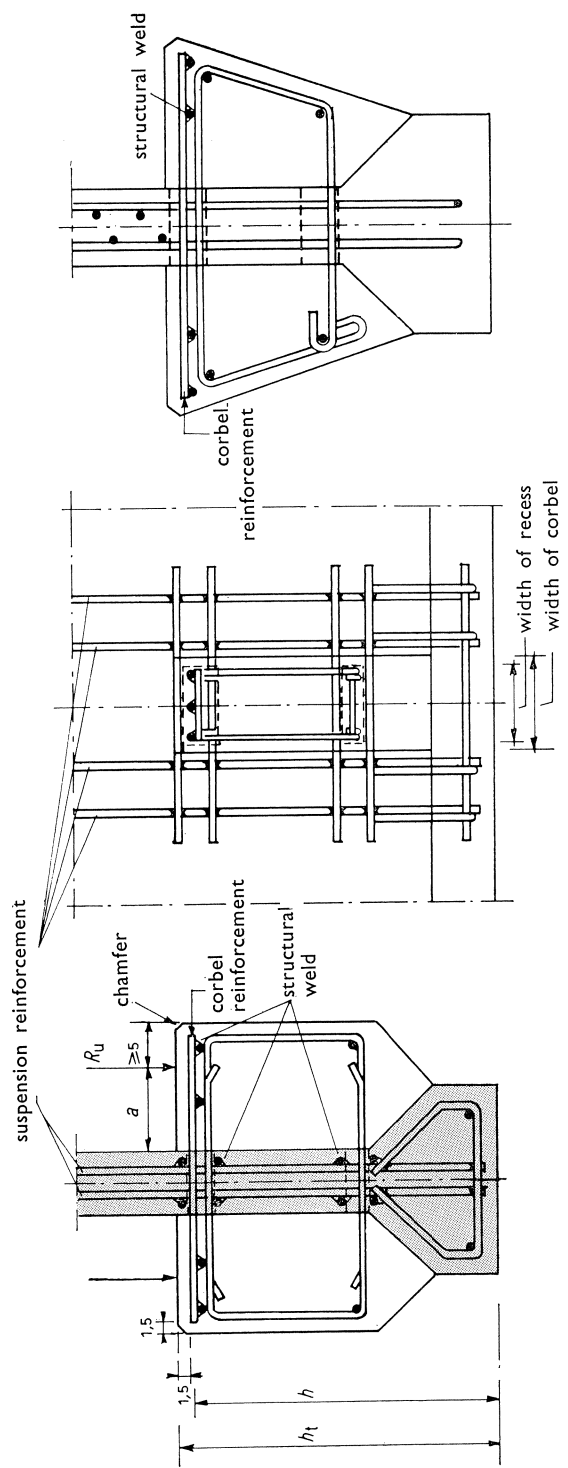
Good construction of a deep corbel subsequently cast on to the beam.
